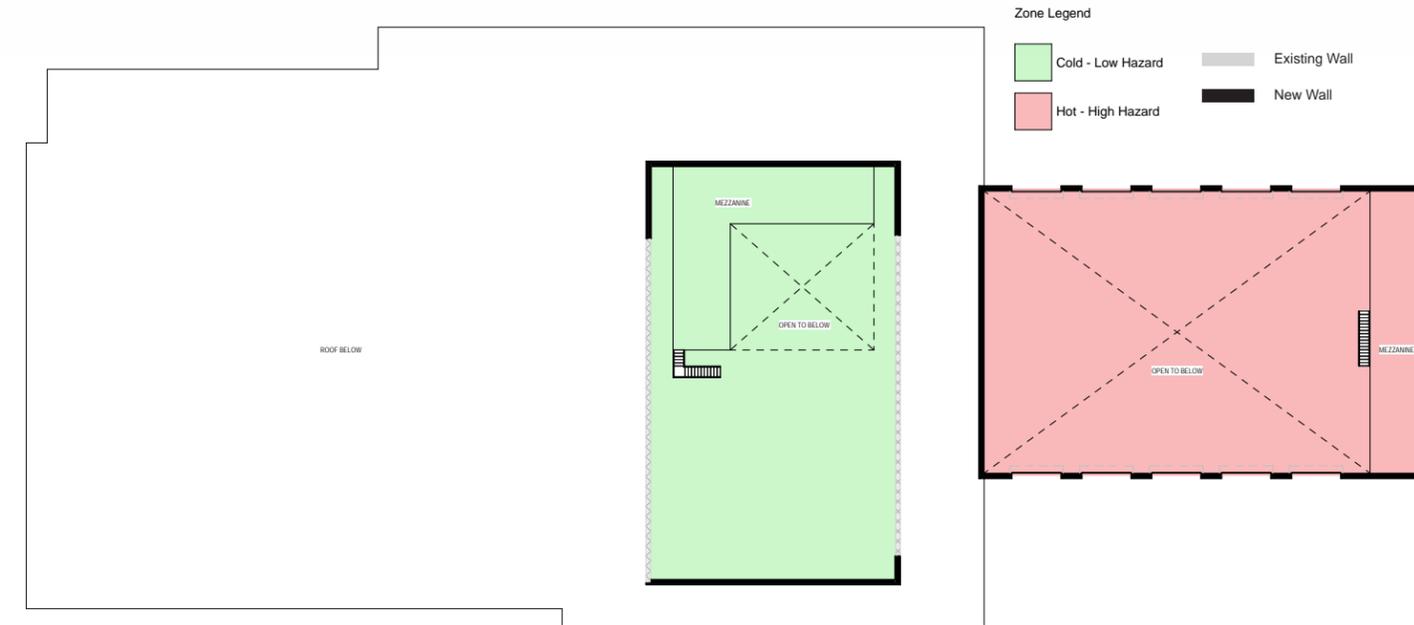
Renovation and Expansion – Hot and Cold Floor Plan
